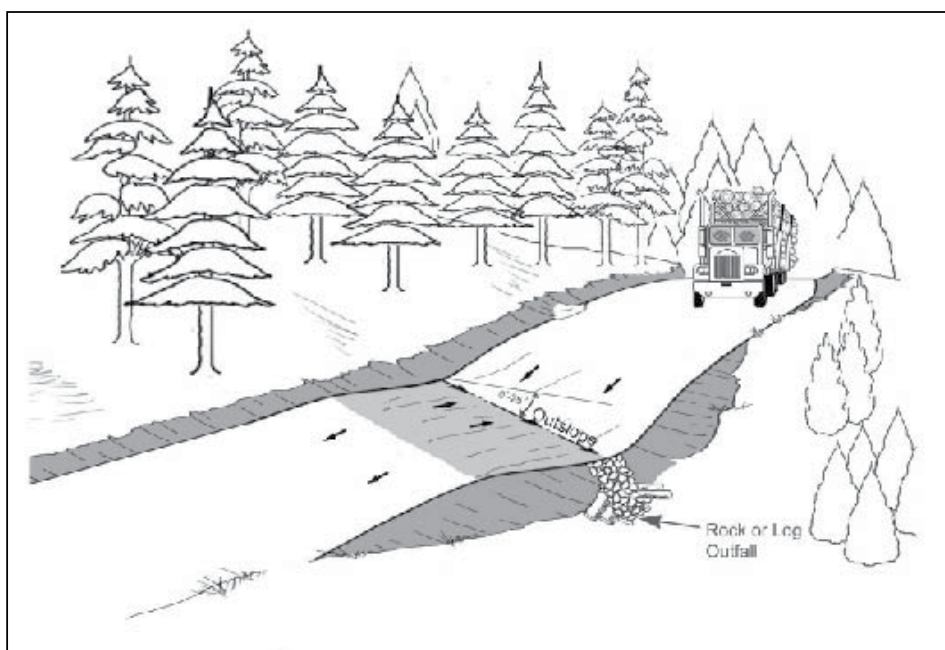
Sketch of a typical rolling dip on a logging road. (Adapted from California Division of Forestry Roads Handbook 1968).
